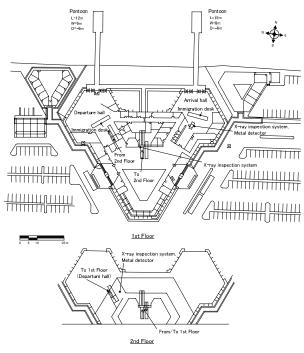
Layout Plan (Passenger Terminal)
